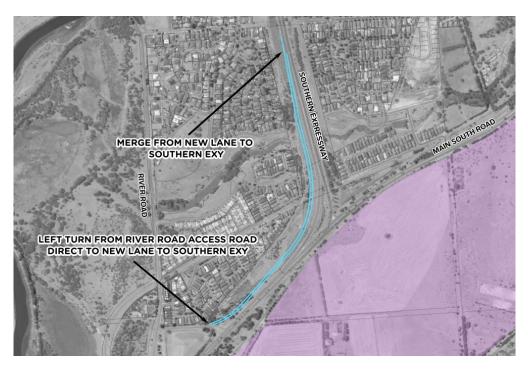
Potential direct connection between River Road Access Road and the Southern Expressway
